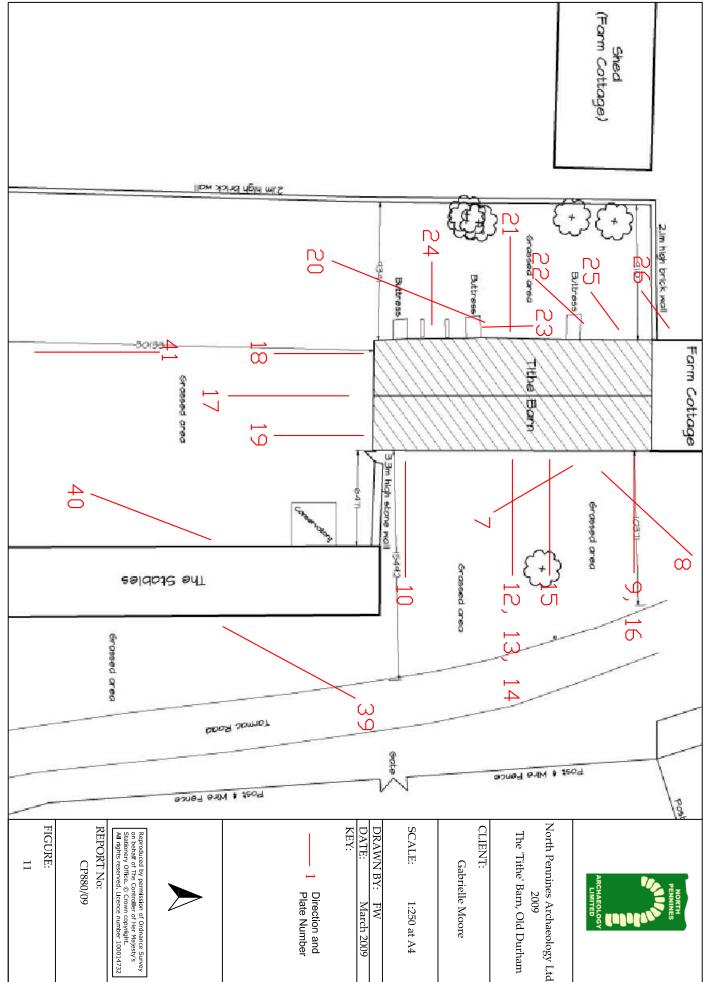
Plan showing directions of photographs (ground plan courtesy of Wearmouth Architectural Design)
